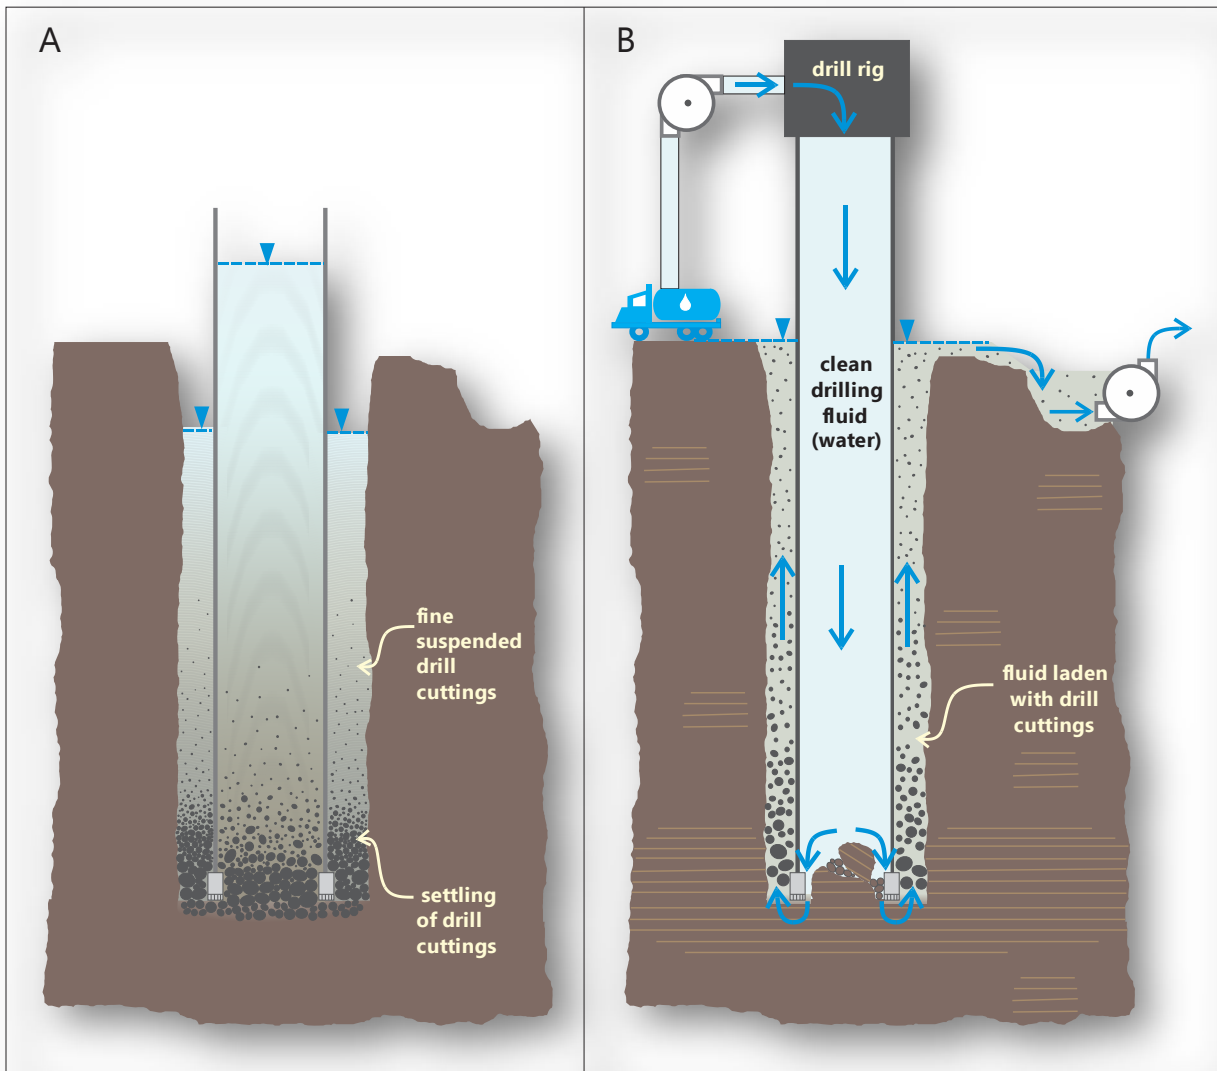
A) Cuttings settled inside the drill casing; and B) Sediment not fully removed from the drill casing, prior to coring
